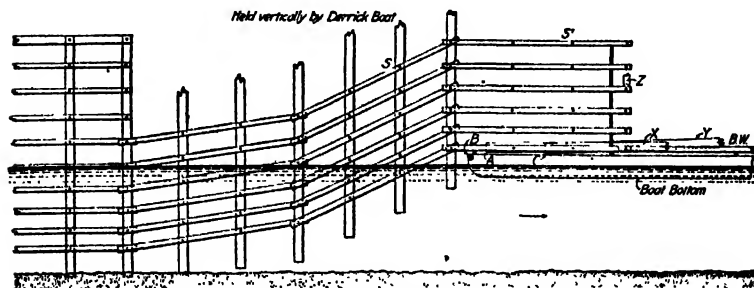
Method of Constructing Ohio River Cofferdam
